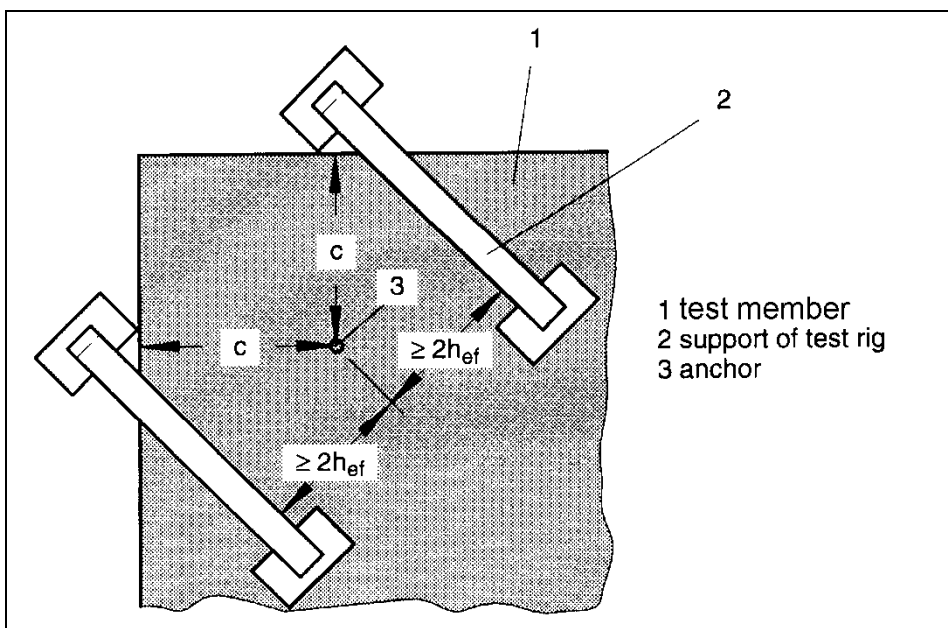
Example of the test rig for tension tests on fasteners at a corner
